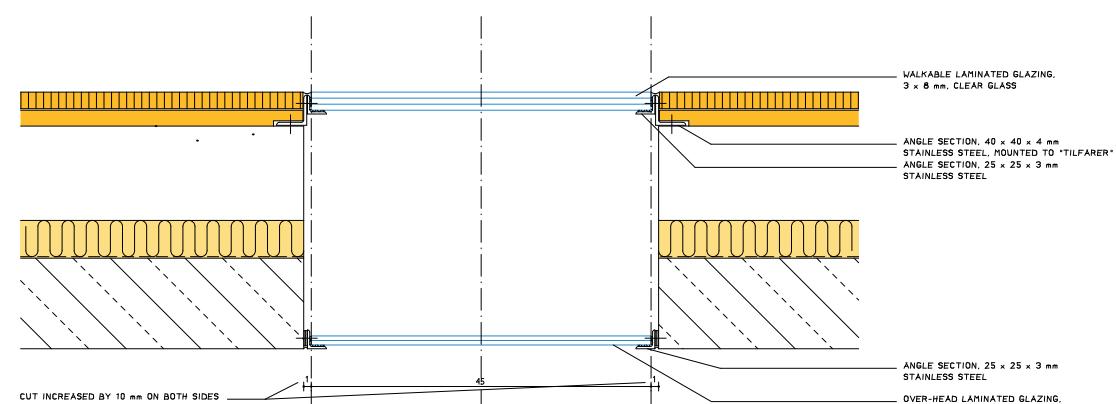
DETAIL "MATTA C." - WALL GROUND FLOOR - FIRST FLOOR 1 : 5
